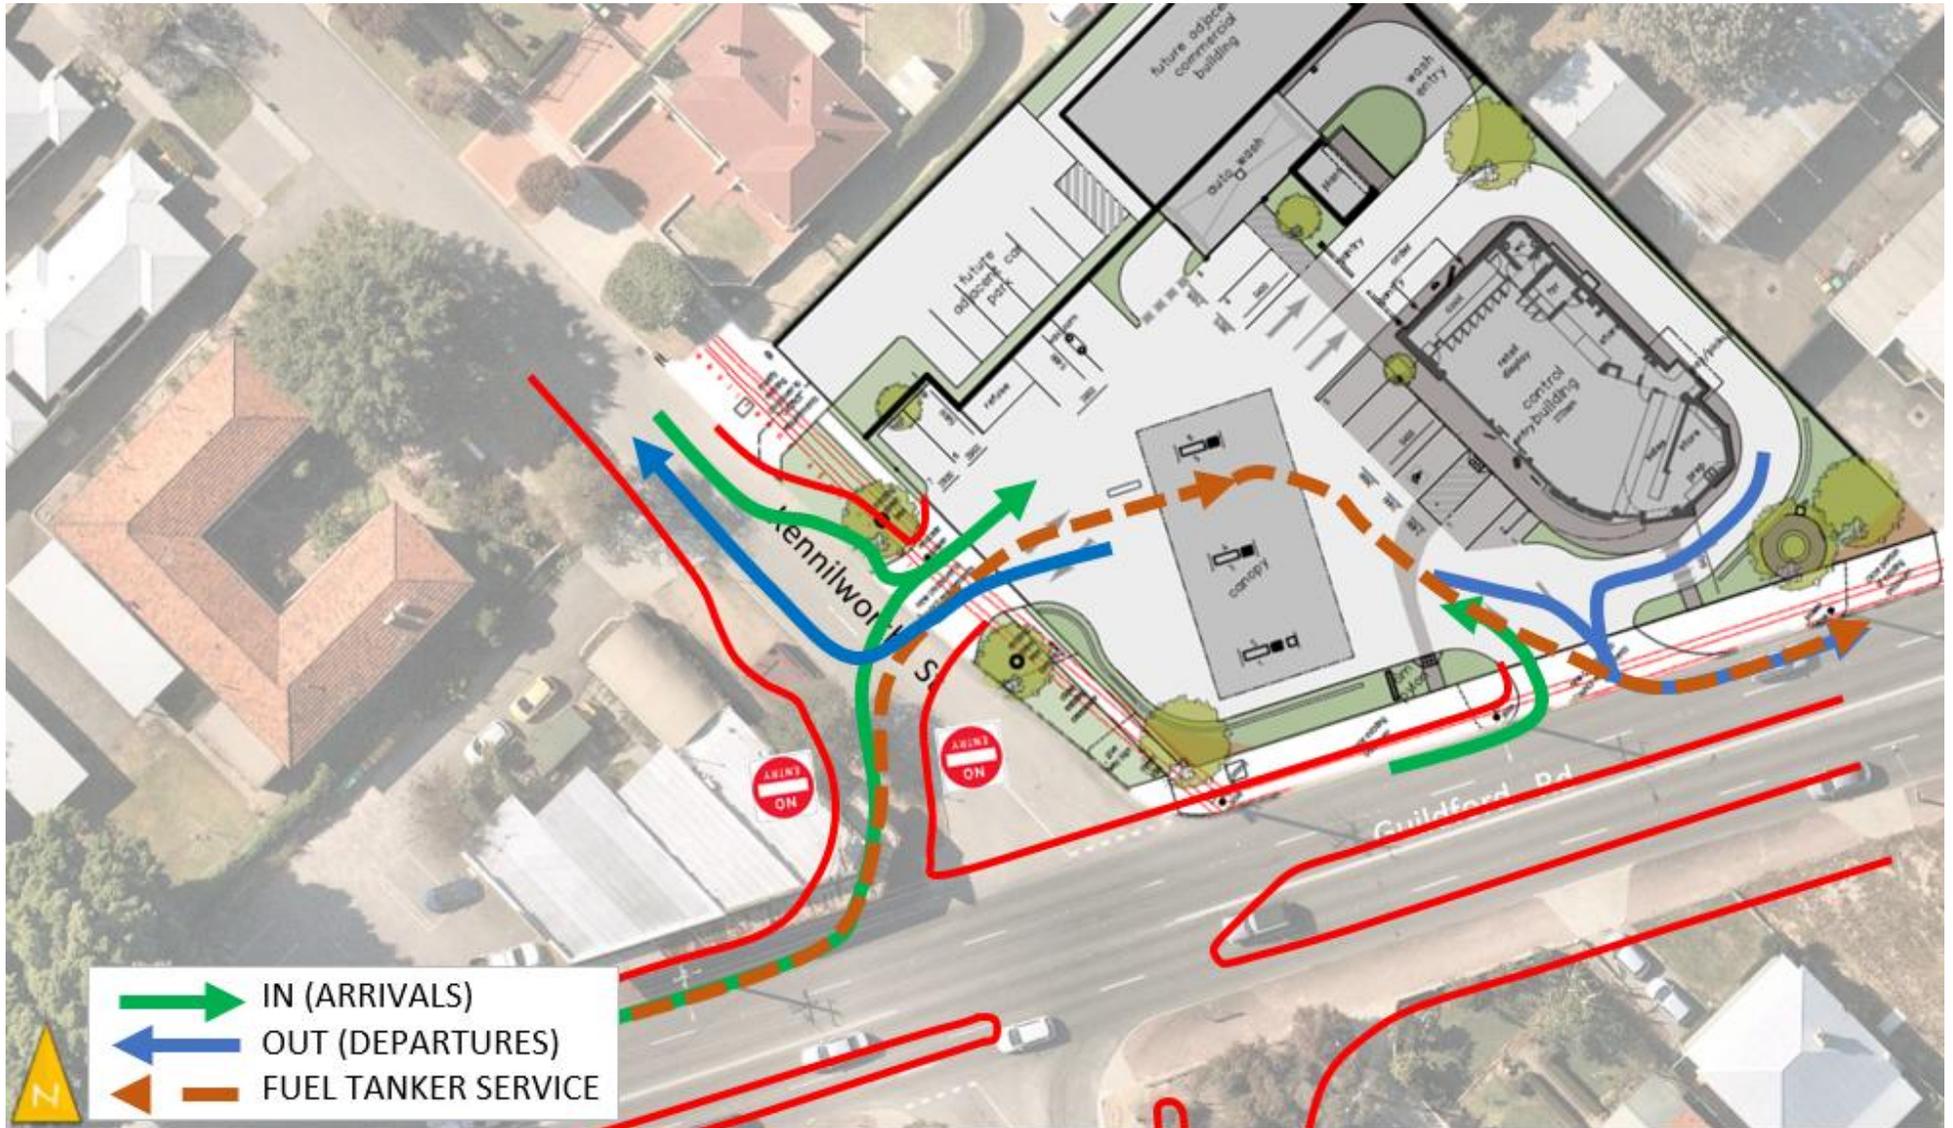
Arrival & Departure Routes dictated by the proposed access driveways and restrictions with proposed Main Roads WA layout
